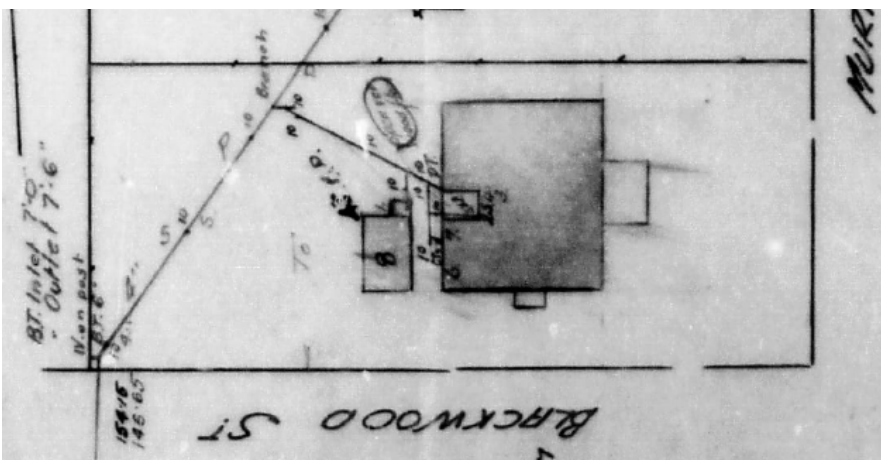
Plan of the subject site dated August 1928, with a footprint of the house and garage, annotated with sewerage works (Source: SEW, Drainage Plan No. 115966)
